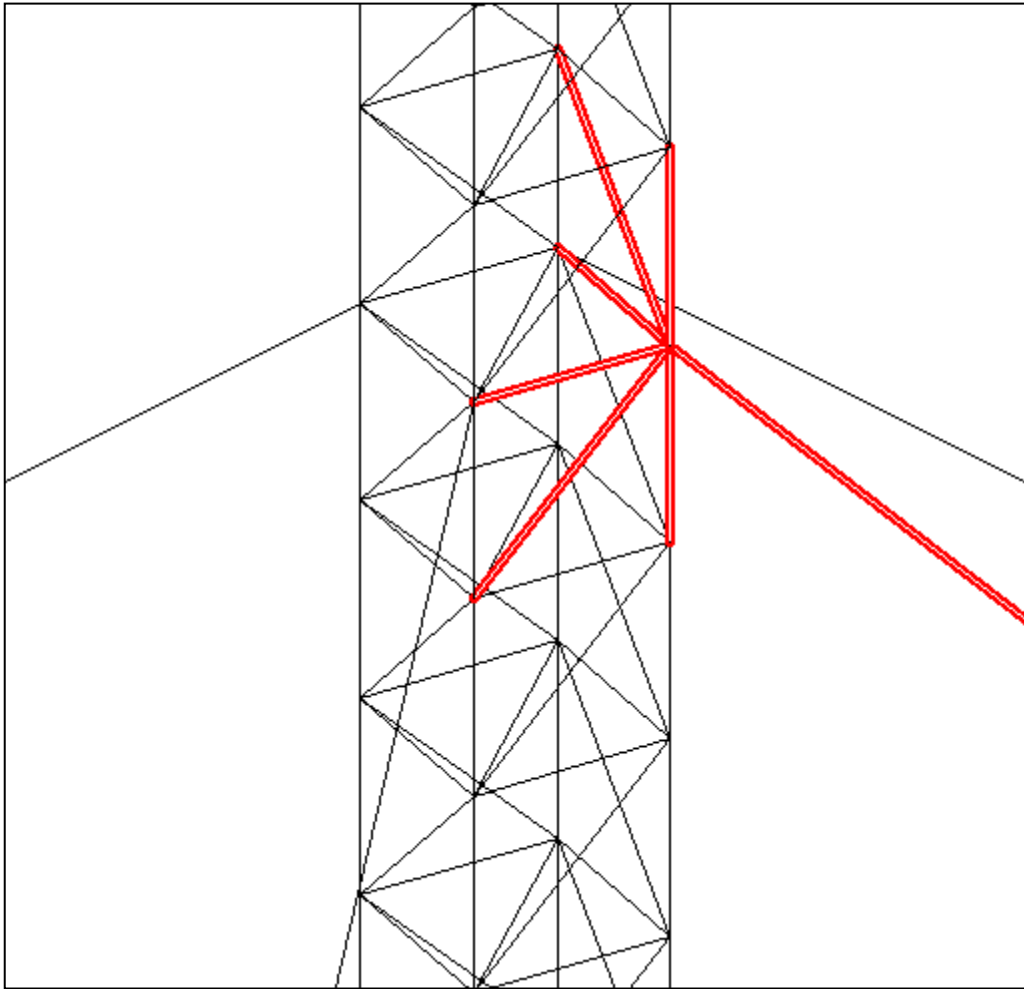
Beam stresses at second intersection of guy cables and tower 50m from base
